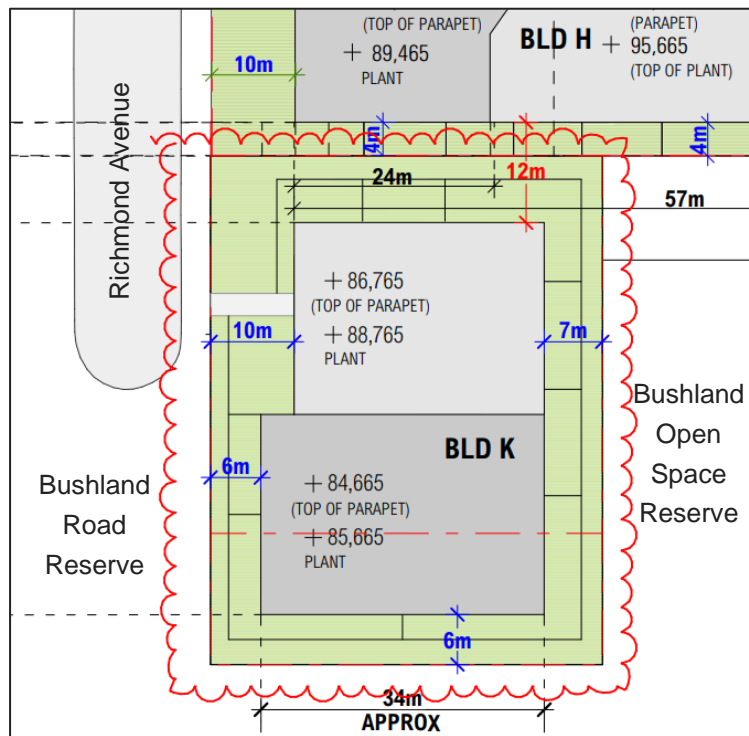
| Extract from proposed building envelope plan showing boundary setbacks (Base image source: SRTS plans)
